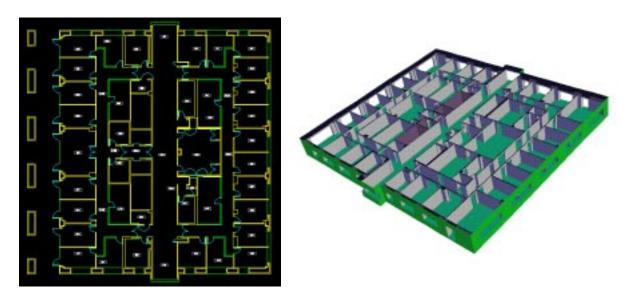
Extruding a model with BMG. On the left, an AutoCAD floorplan. On the right, the automatically extruded 3D floor.
